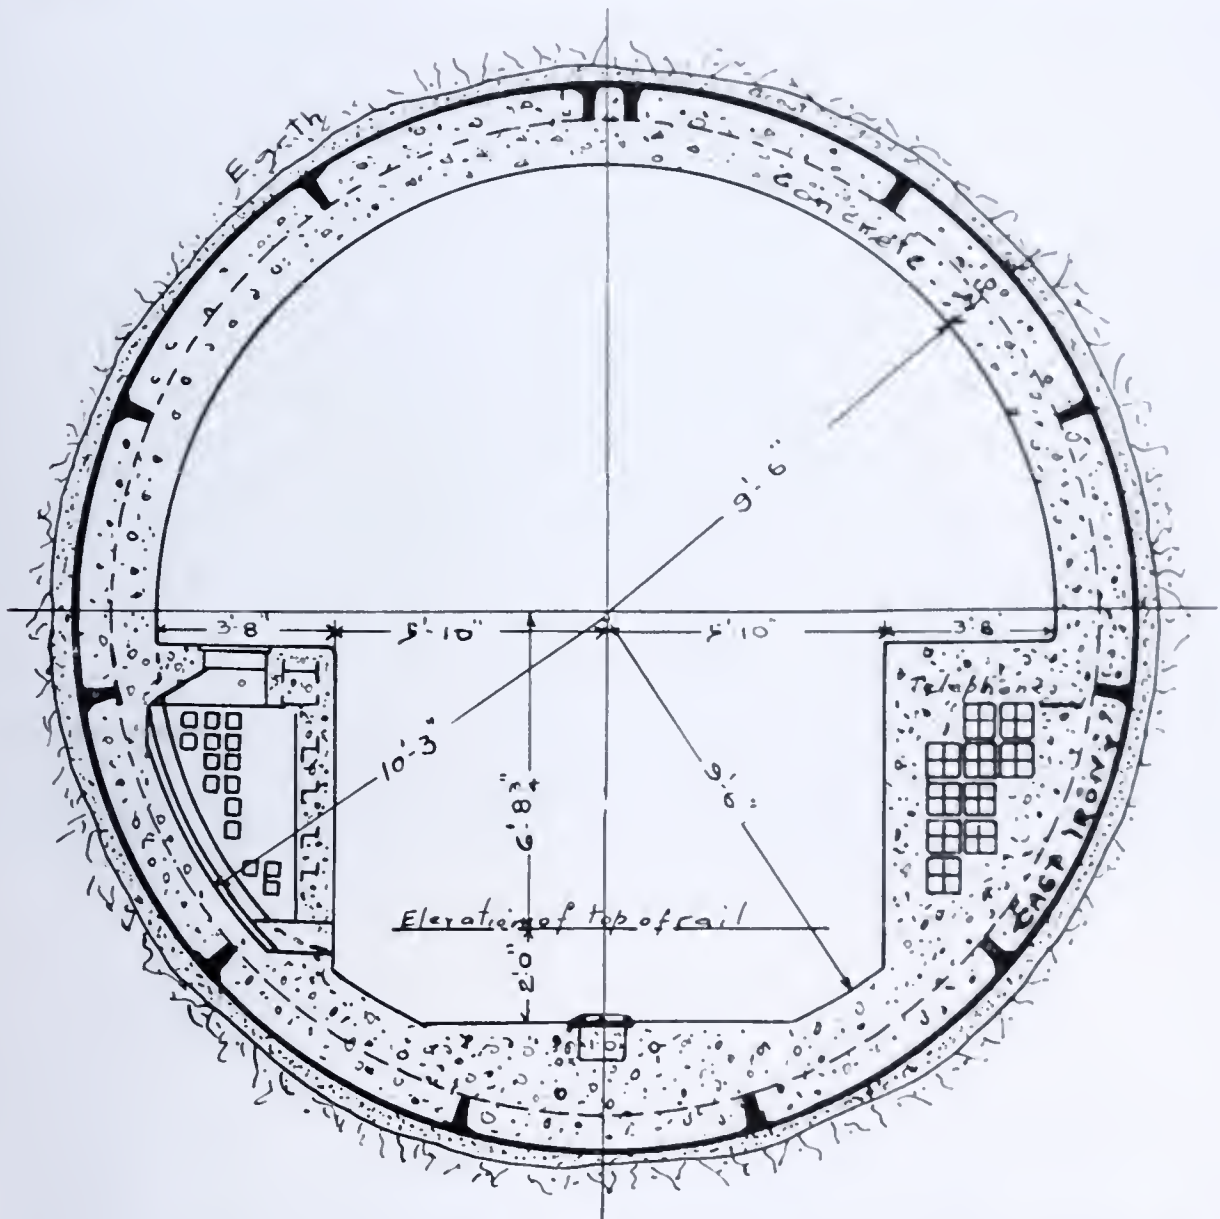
Pennsylvania Railroad East River Tunnels, Concrete Lining.
